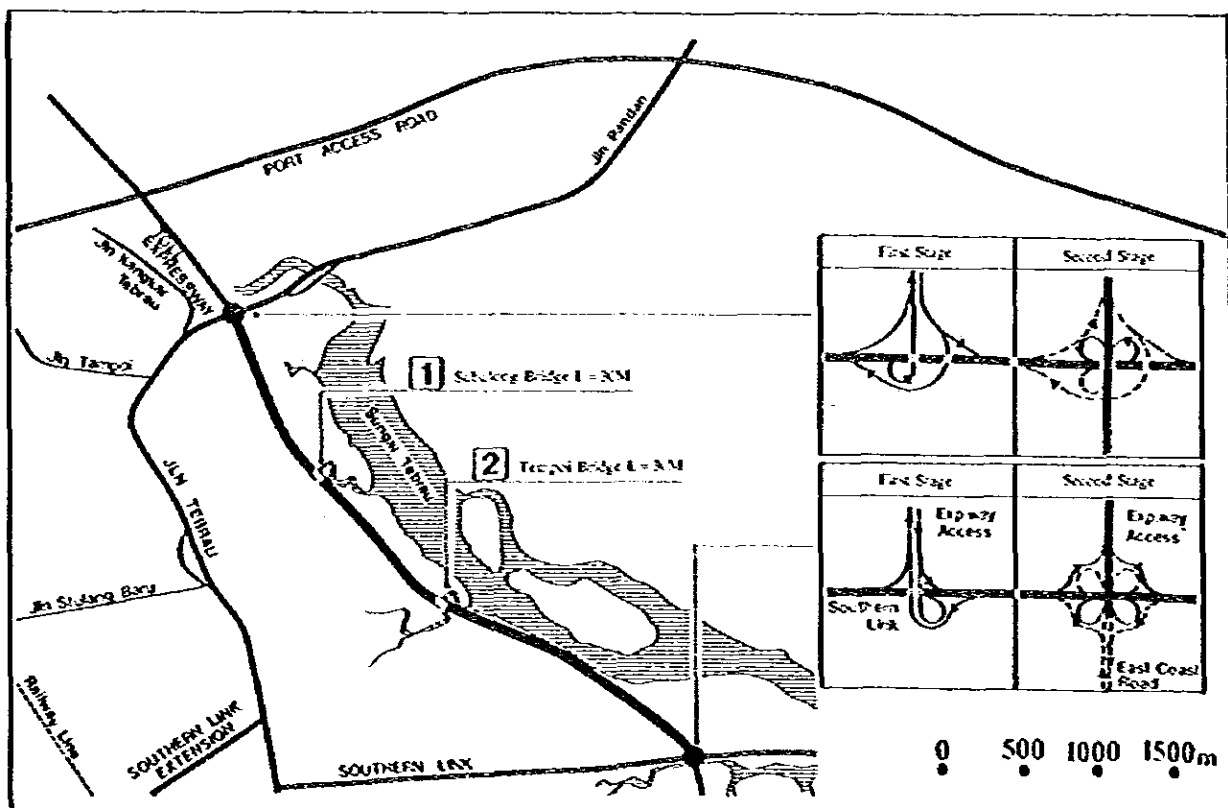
RECOMMENDED INTERCHANGE/BRIDGE PLAN FOR THE TOLL EXPRESSWAY ACCESS ROAD
